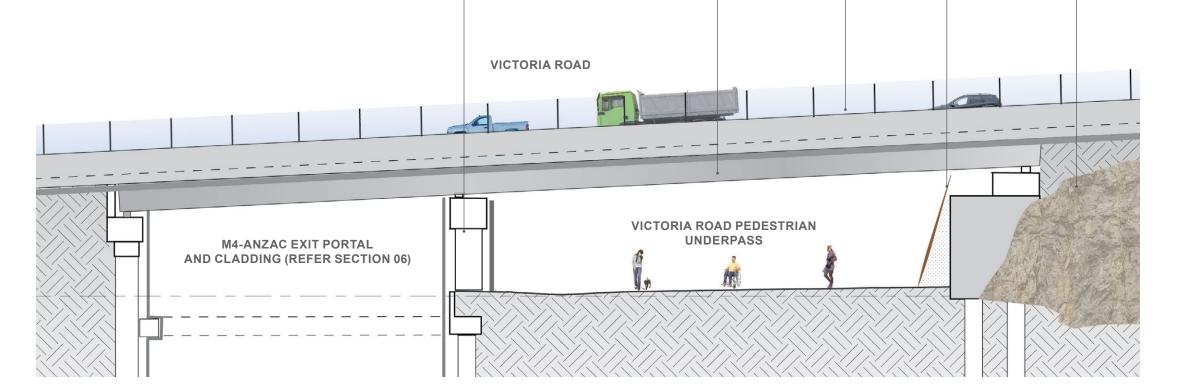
Rozelle Rail Yards - Victoria Road Pedestrian Underpass - typical cross section
